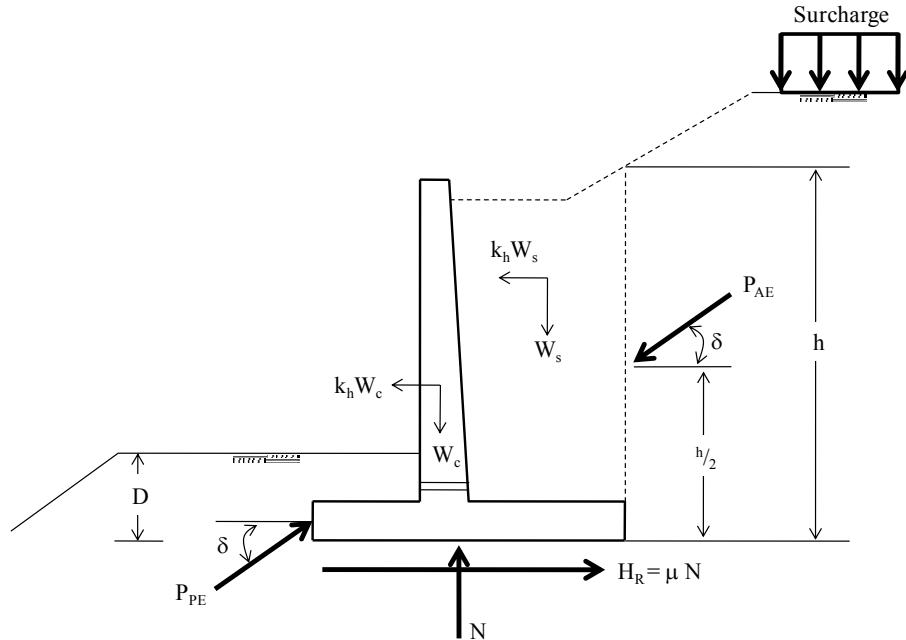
Seismic Forces on a Semi-gravity Retaining Wall
